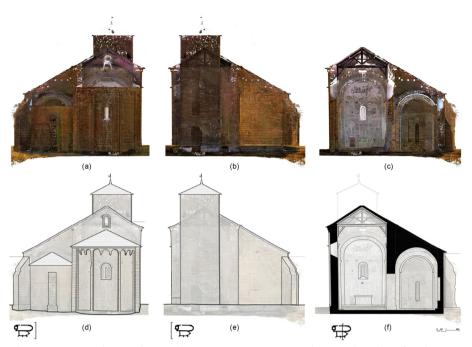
Laser scan orthoimages: a) West elevation; b) East elevation; c) Transverse section. Elevation plans drawn from laser scan data: d) West elevation; e) East elevation; f) Transverse section (Source: the authors)
